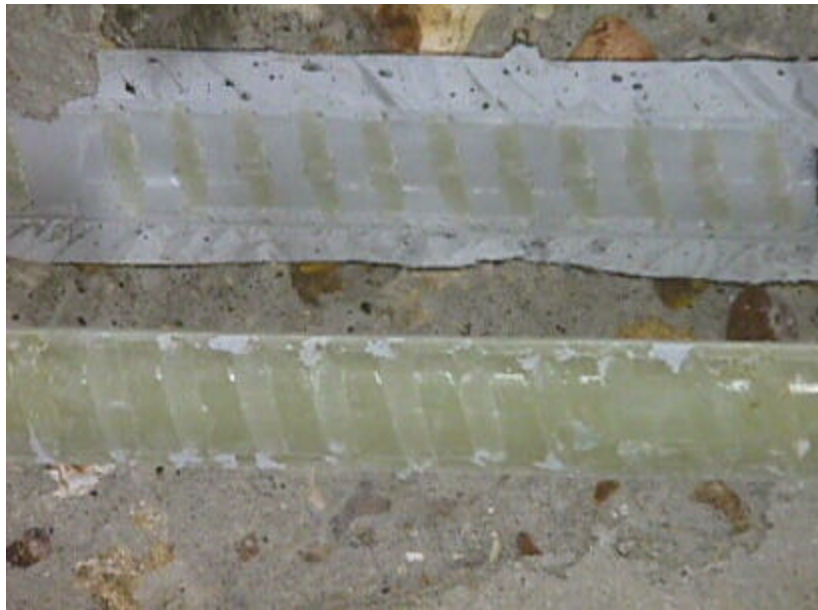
Bond failure due to pull out of the rod with shearing of lugs.
